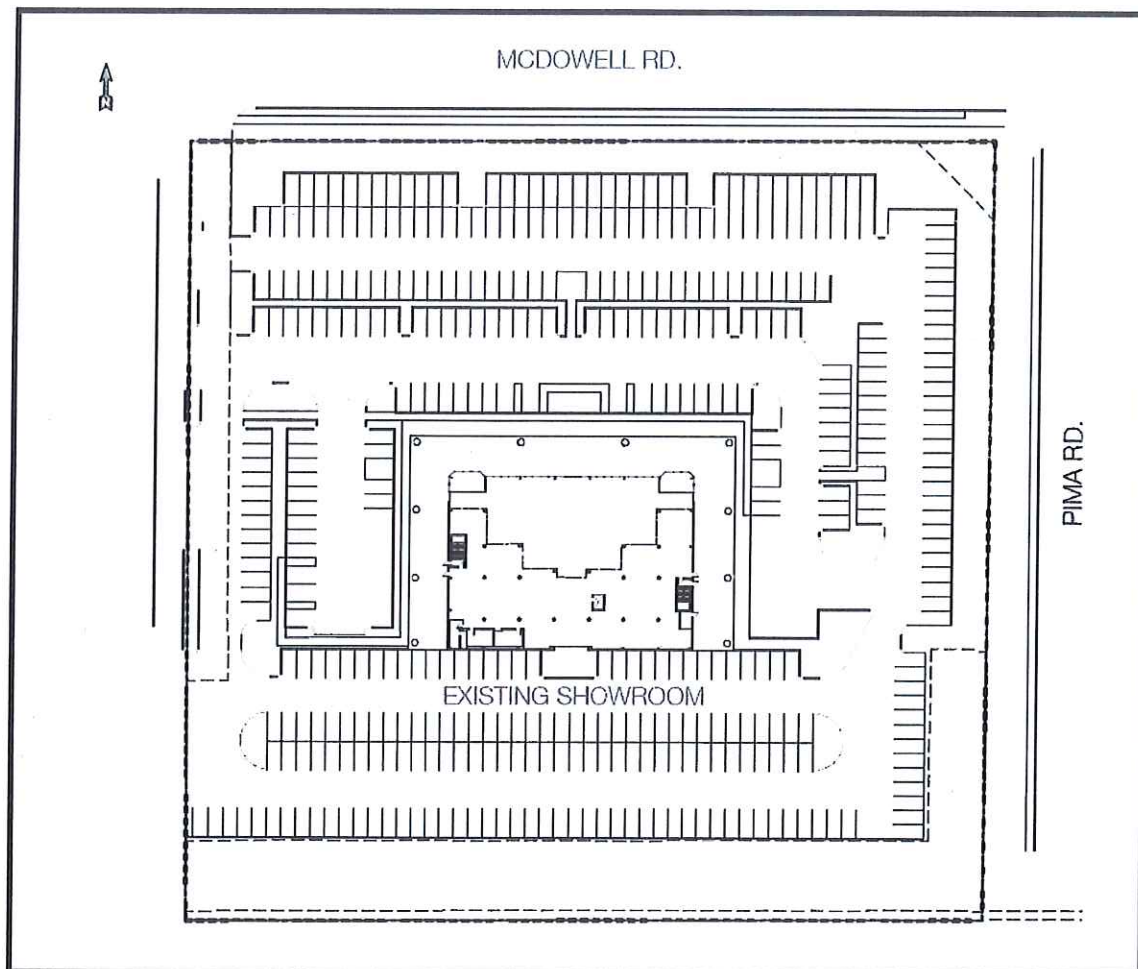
Existing Building and Parking at 8705 East McDowell Road
